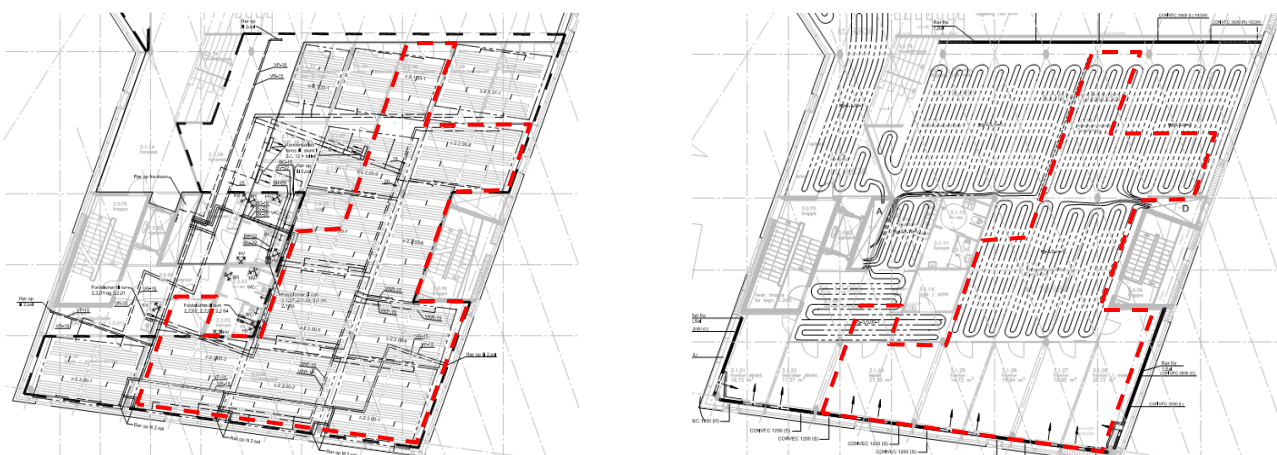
Cooling systems with evidence of the room (red dotted line). First floor - tabs in the ceiling of the room, and Second Floor – floor cooling of Plateau 4.
